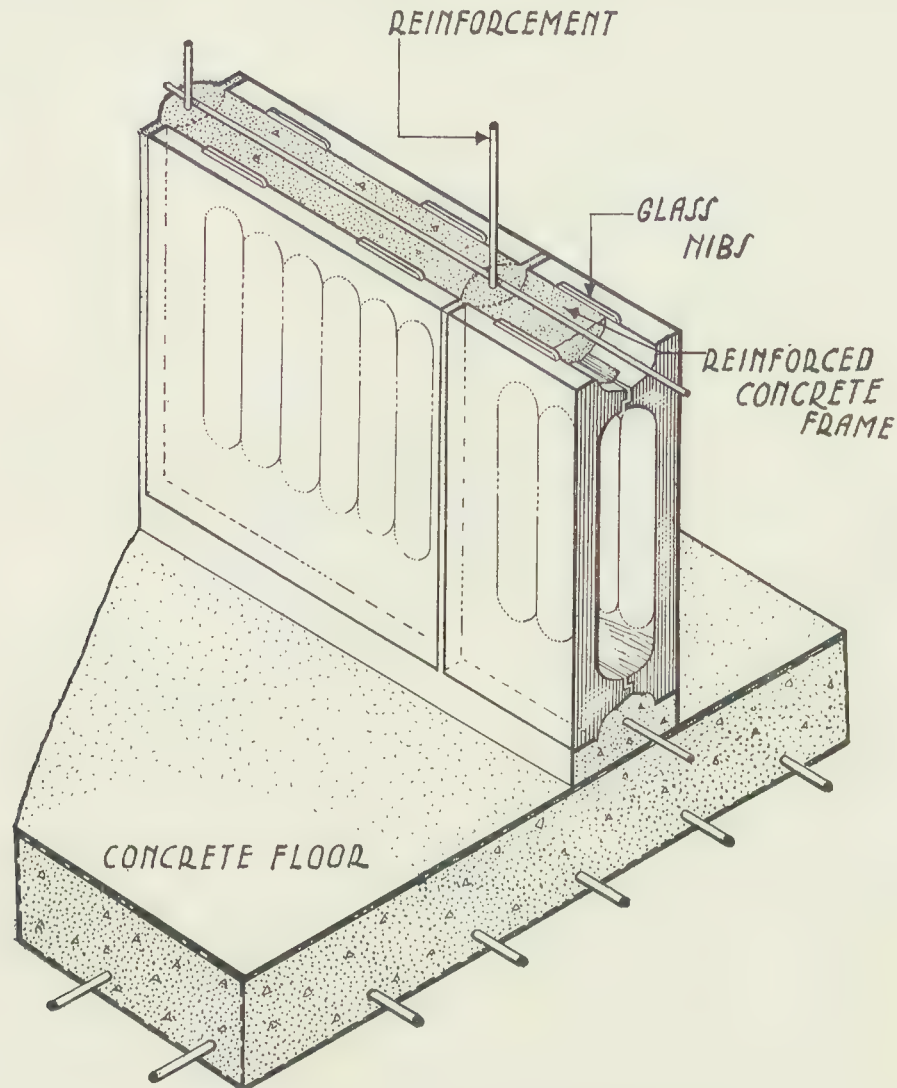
CONSTRUCTION OF A GLASS UNIT PARTITION WALL
